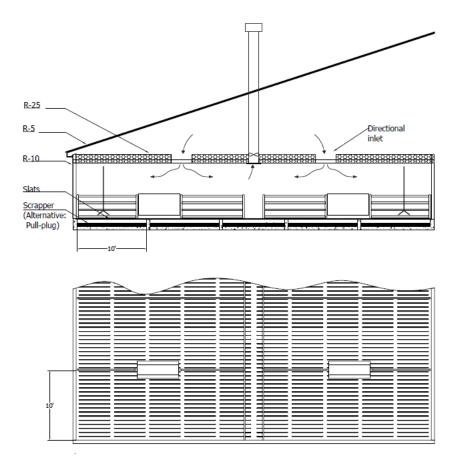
Half section and plan view of GPB C and D, full-slat barns.
